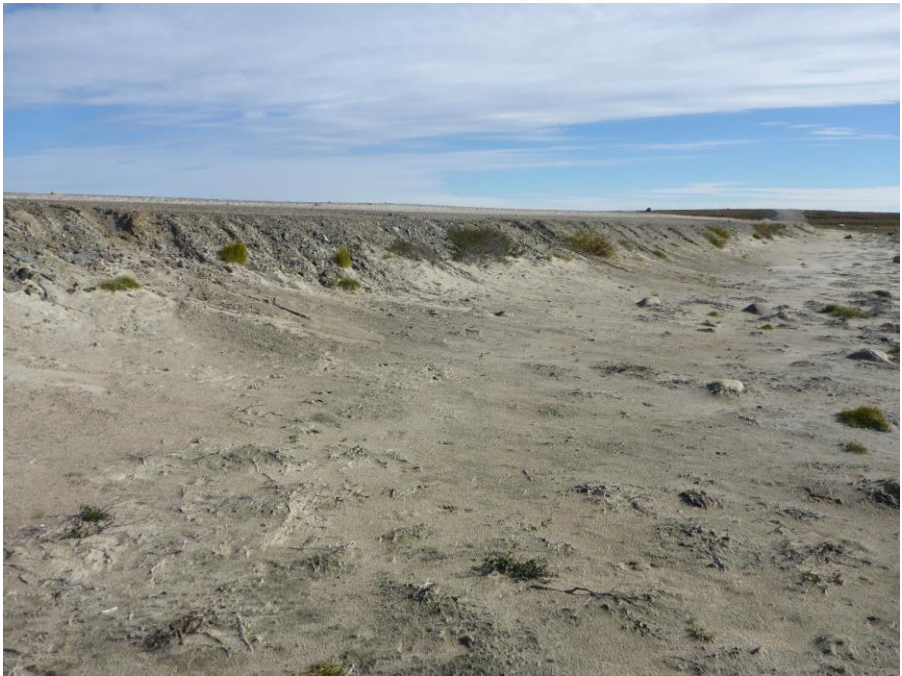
Looking at the downstream slope from the north abutment. Note the erosion gullies.
